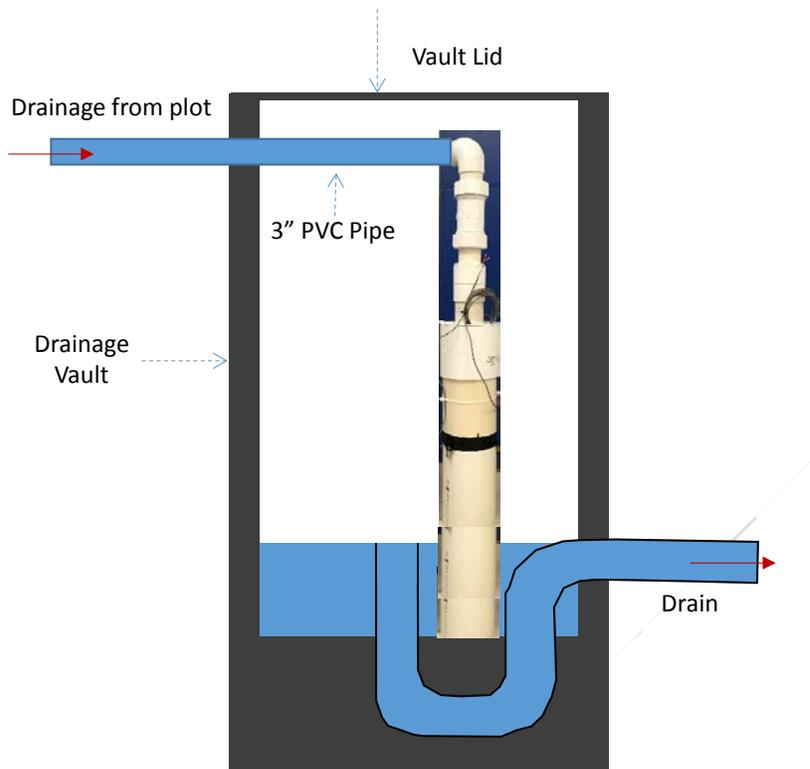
Schematic showing the installation of a DTB system in a drainage vault (Not to scale).
